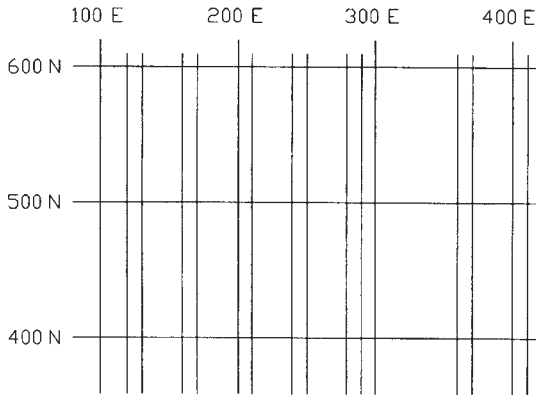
Plan view through the portion of the pit shown in cross-section in Figure 4.75 (toes and crests depicted by solid lines).
